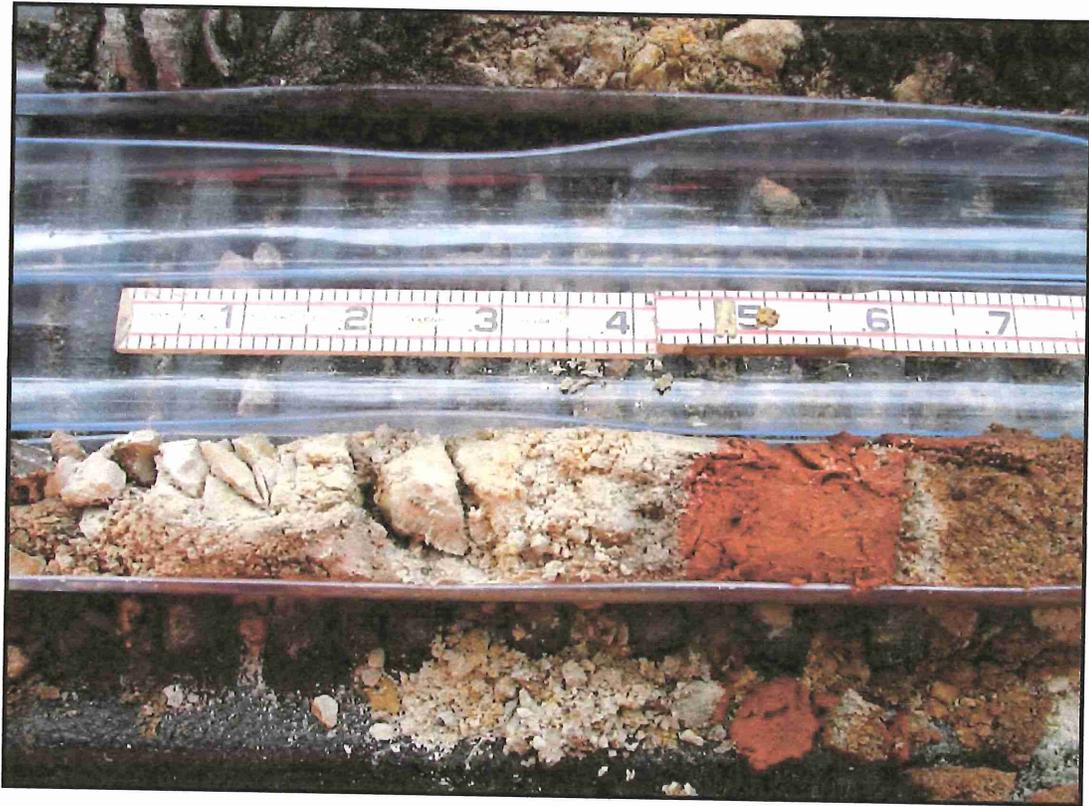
LIMESTONE AND BRICK IN CORE 12-B
